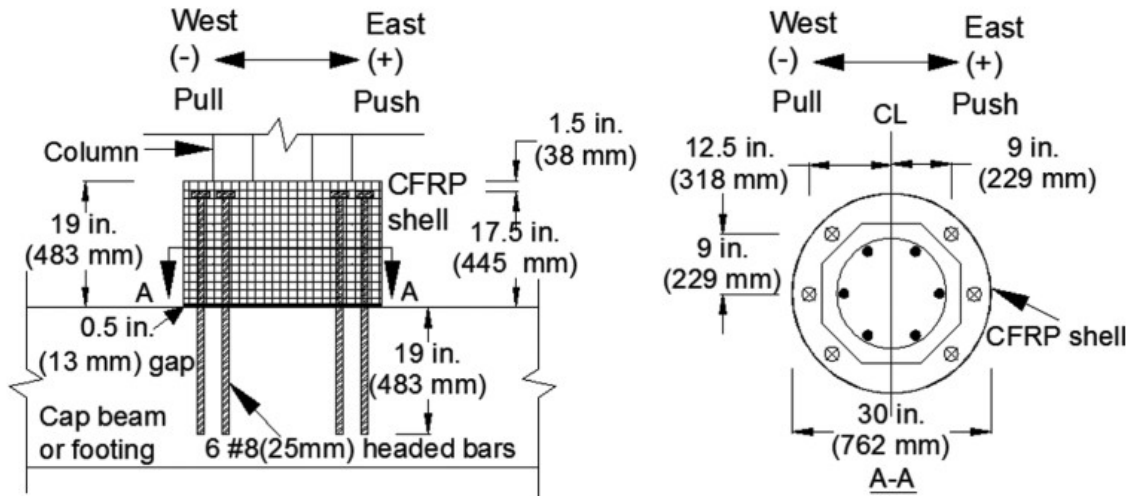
Design Details for Repair of Reinforced Concrete Bridge Columns ([Wu & Pantelides 2017, p. 1343](#))
